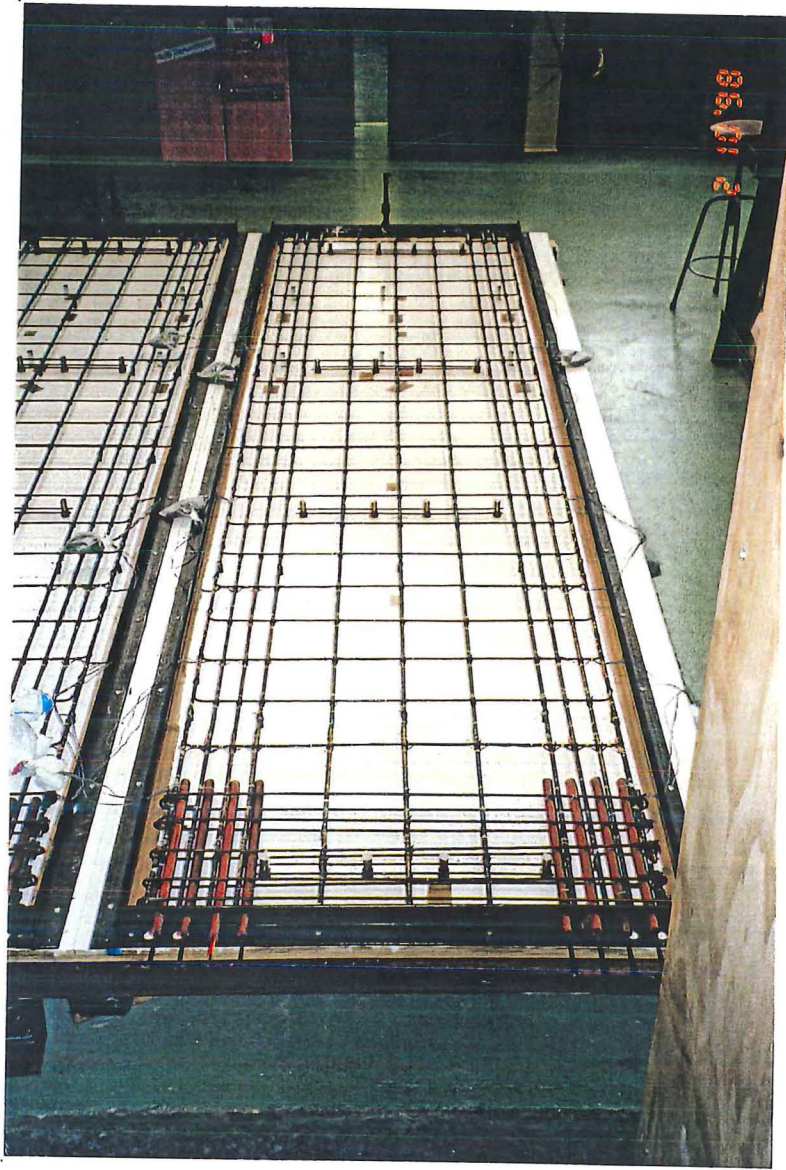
Reinforcing cage of wall panel prior to concrete casting for Units 1 and 2
